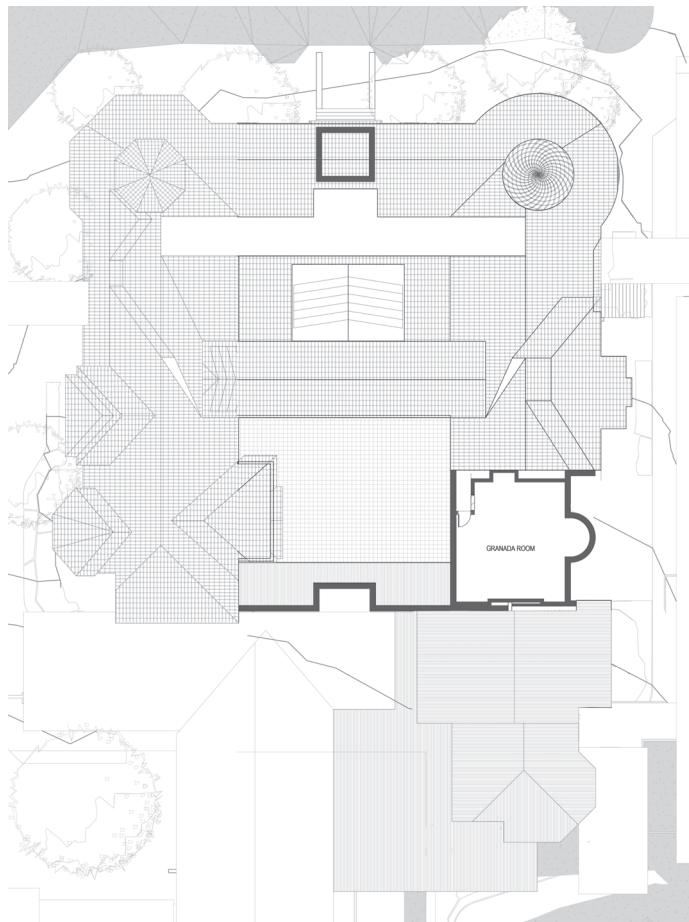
St John of God Richmond Hospital. Belmont House Existing First Floor Plan. STH October 2021. Belmont House outlined in blue.
